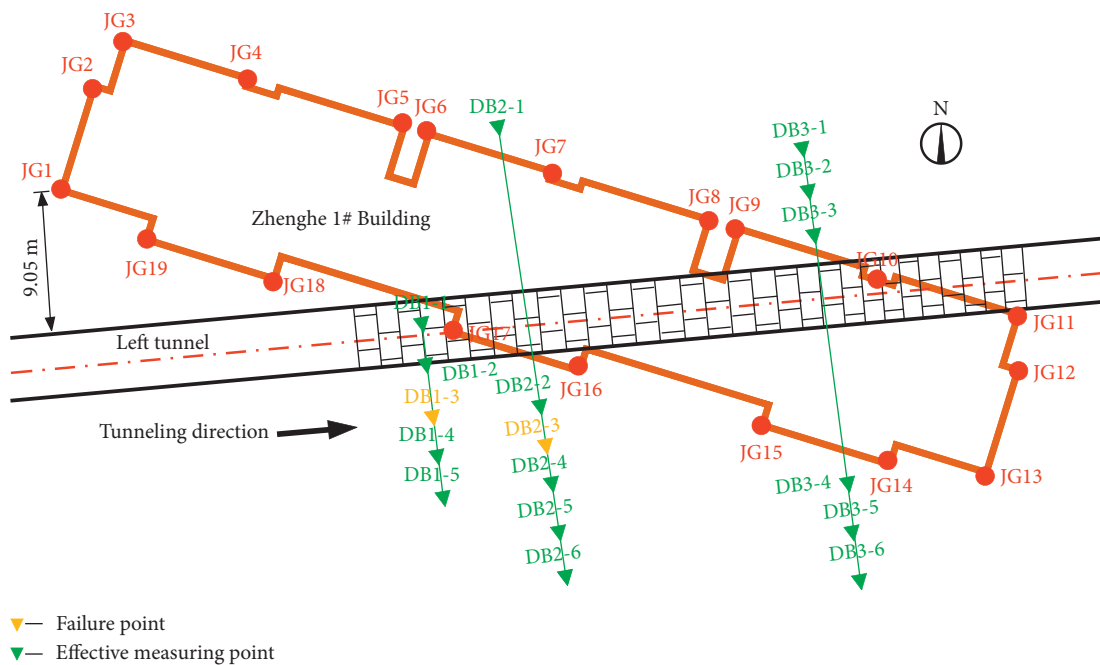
The relative position between building and tunnel and the plan of monitoring instruments.
